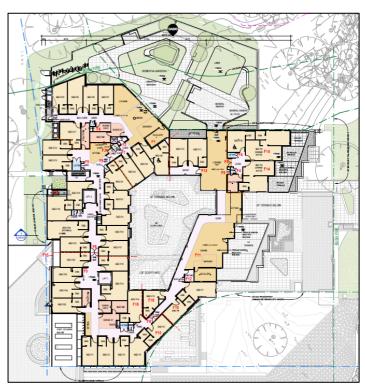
Proposed Plans – First Floor Source: Morrison Design Partnership Pty Ltd
